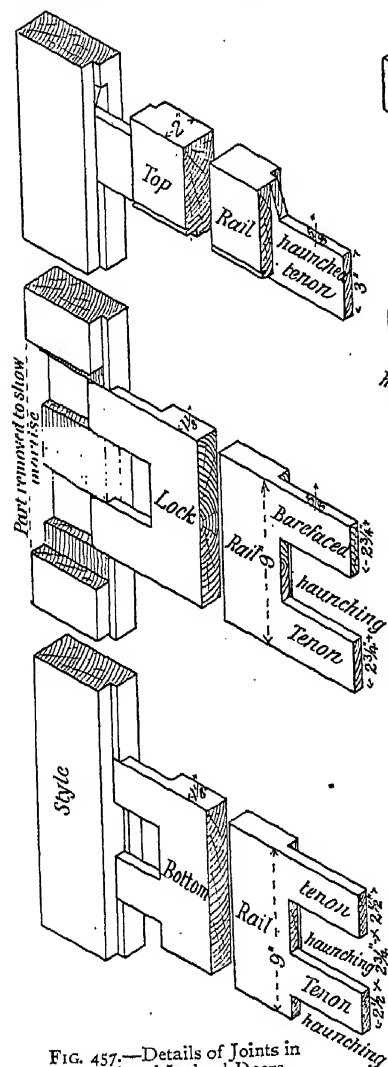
Details of Joints in Framed and Lugged Doors.
